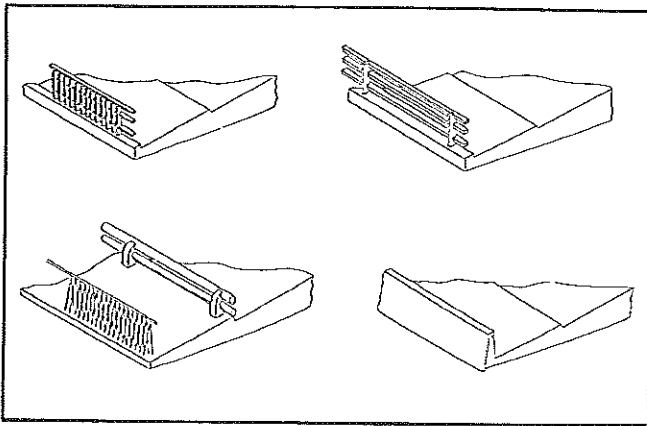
Diagrams of parapet options considered. The adopted parapet is shown at the lower right.
